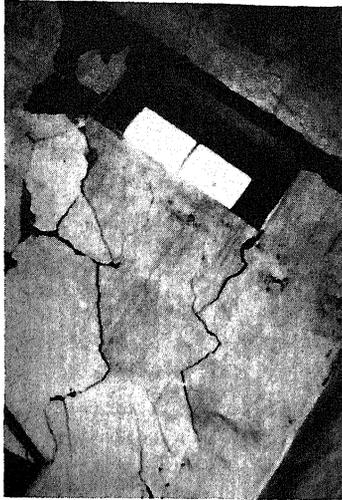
L.R.Girls High School, Darbhanga (Cracking of walls and roof)
